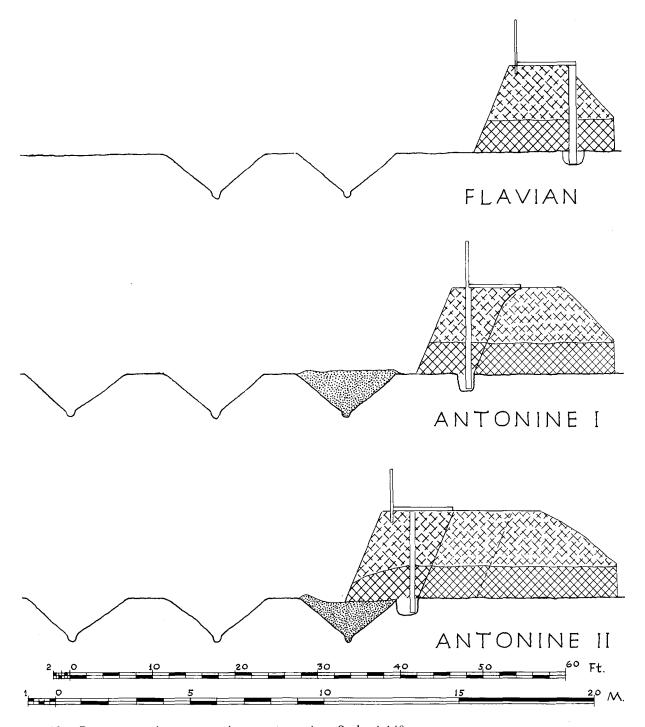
Rampart section: composite reconstruction. Scale, 1:140.
